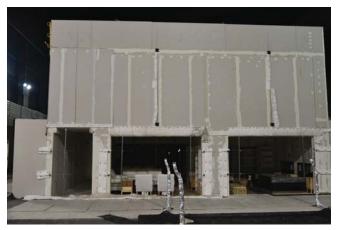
Second-level openings on Wall A covered with Type X wallboard for Test 1.
